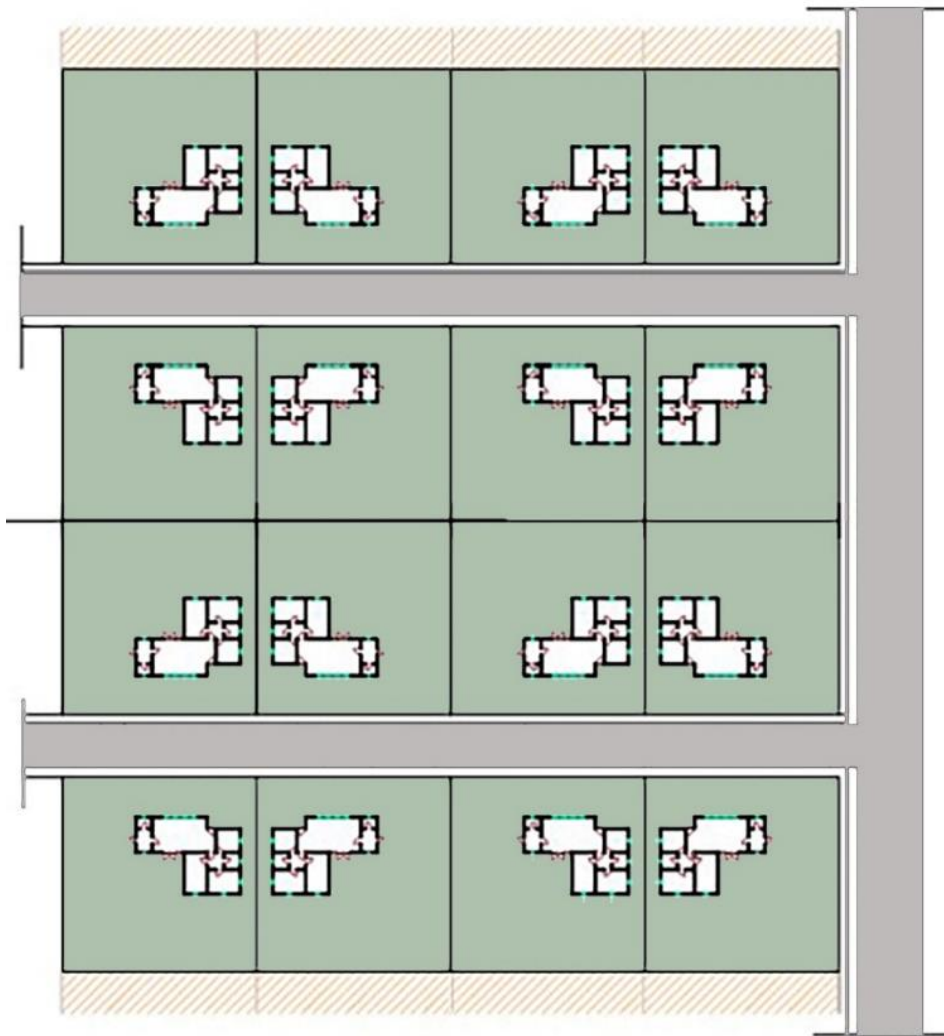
Site plan of a typical housing pattern. Source: Prepared by the authors.
